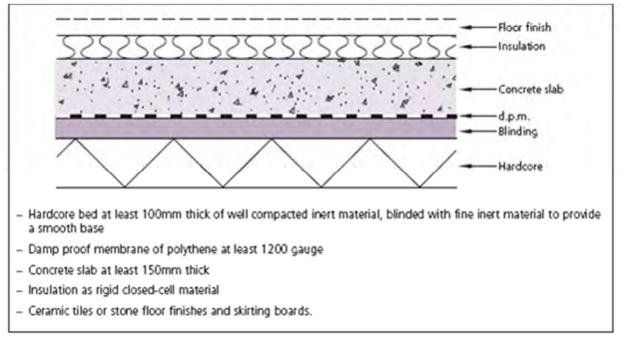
Ground-supported floor (Source: DCLG, *Improving the Flood Performance of New Buildings* 2007)
